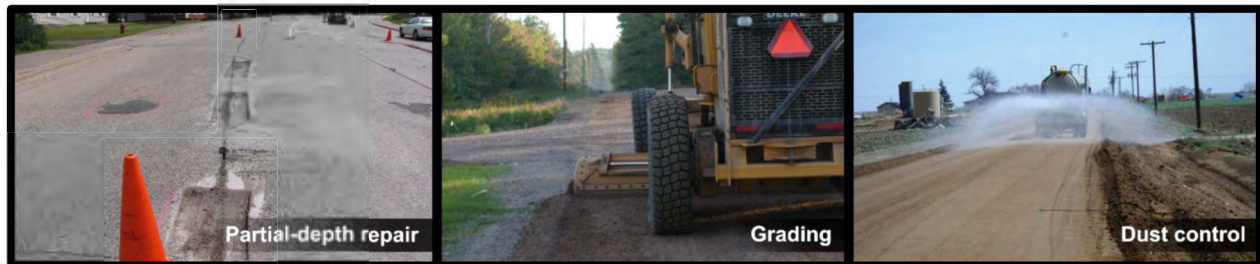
Examples of capital preventive maintenance treatments, cont'd—(from left) concrete road prepared for partial-depth repair, gravel road undergoing maintenance grading, and gravel road receiving dust control application (dust control photo courtesy of Weld County, Colorado, weldgov.com).
